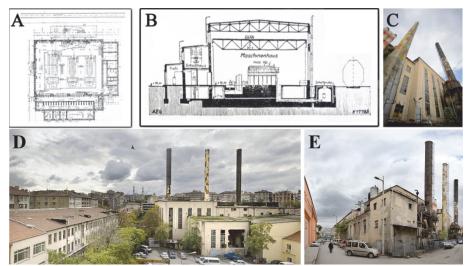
(A) Ankara Power Plant Plan, (B) Ankara Power Plant Steel Roof Truss System, (C), (D), (E) Ankara Power Plant (BCA 230-0-0-0/5/17/1, URL 2)
